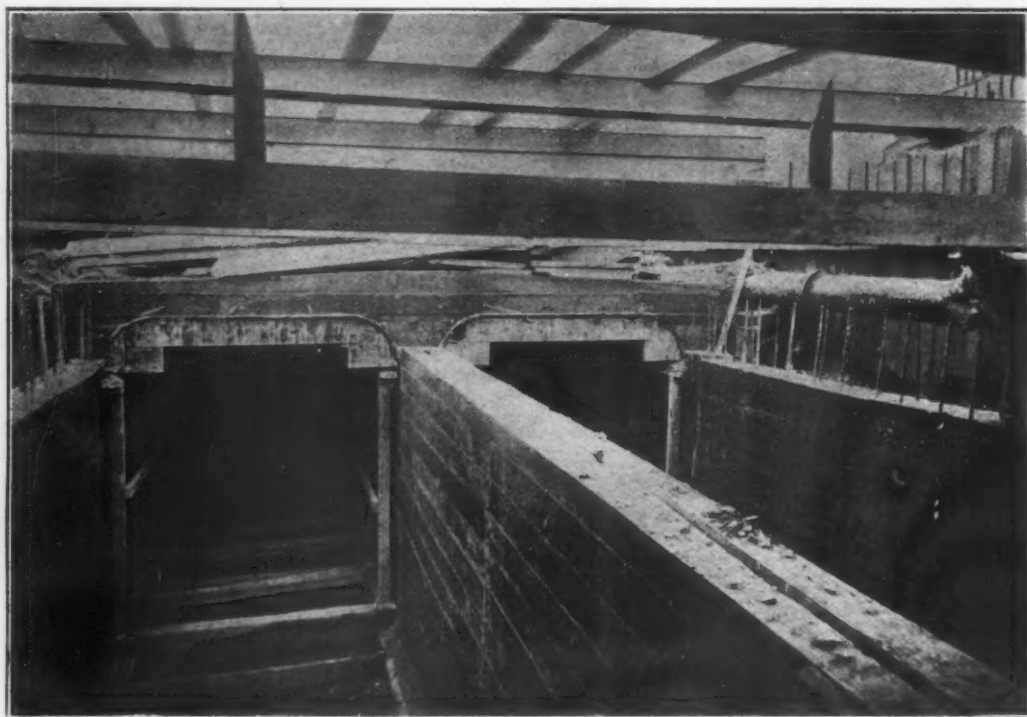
The Roxbury Sewer, Boston, Mass., Reinforced with Havemeyer Steel Bars.
